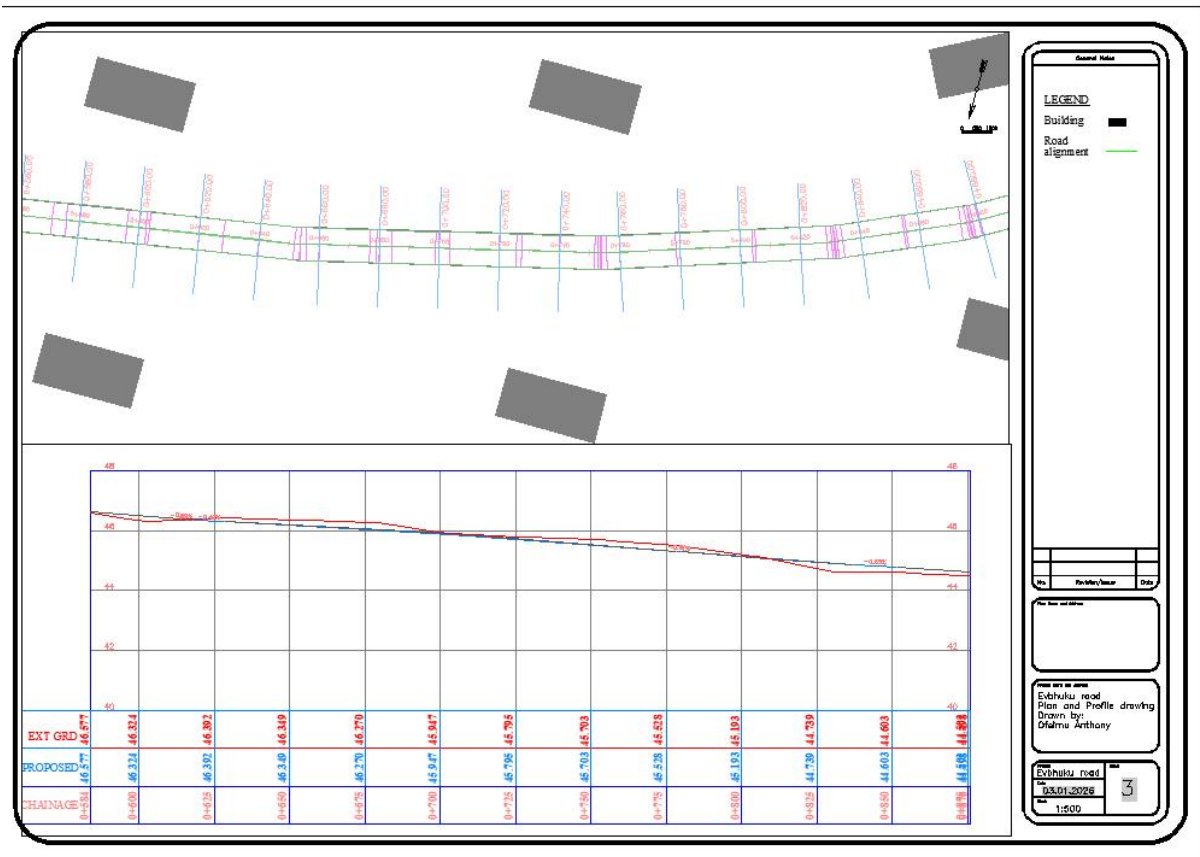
Plan and Profile Drawing (0+554 – 0+876)
